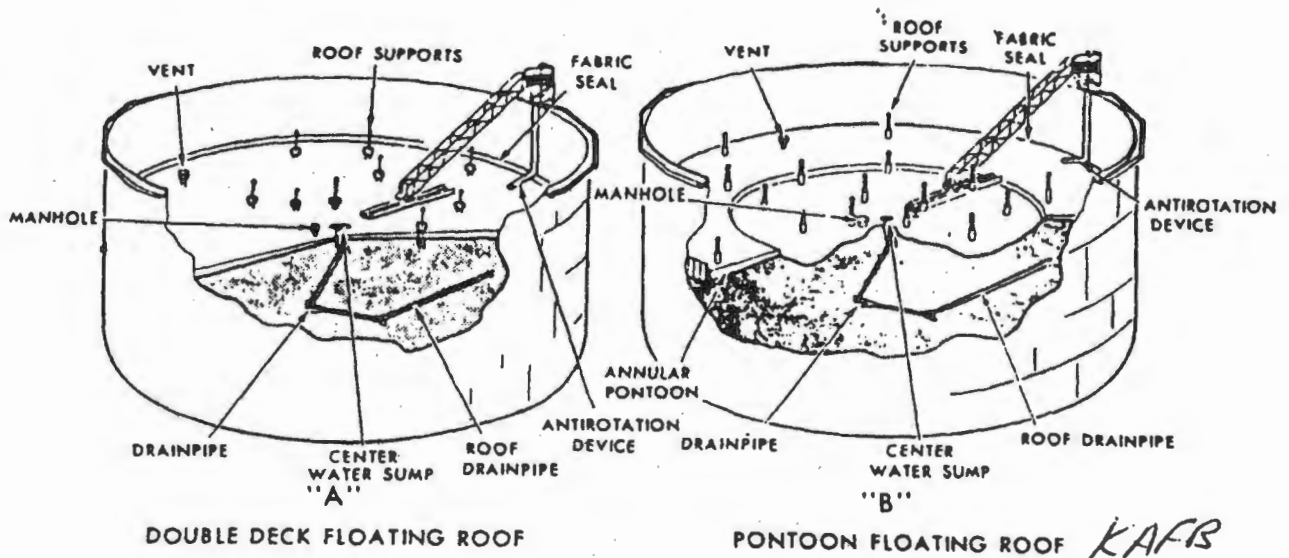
Two Styles of Above Ground Floating Roof Tanks
